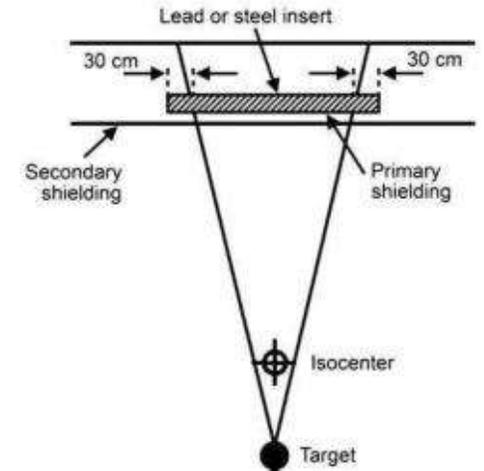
Arrangement for the primary barrier when lead or steel is used to maintain a uniform wall thickness.
